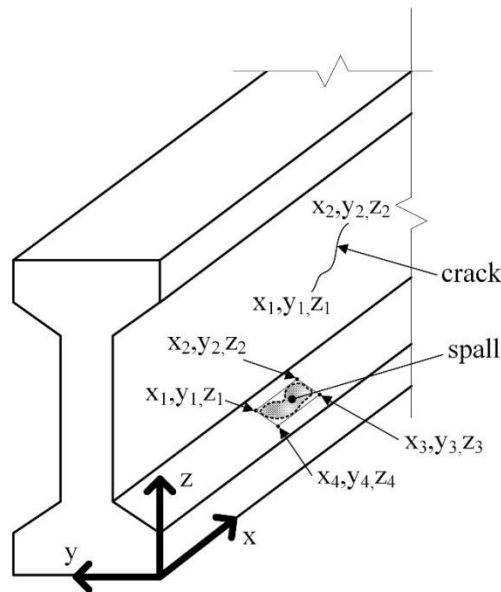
Illustration. Location of local element origin and defect coordinates on concrete I-beam—isometric view.
